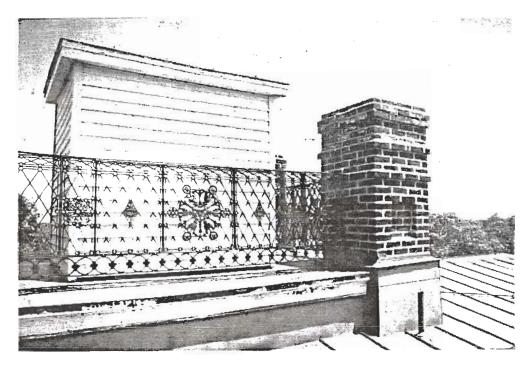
South Elevation of Roof Vent Structure Showing Cast Iron Filigree Railing.
